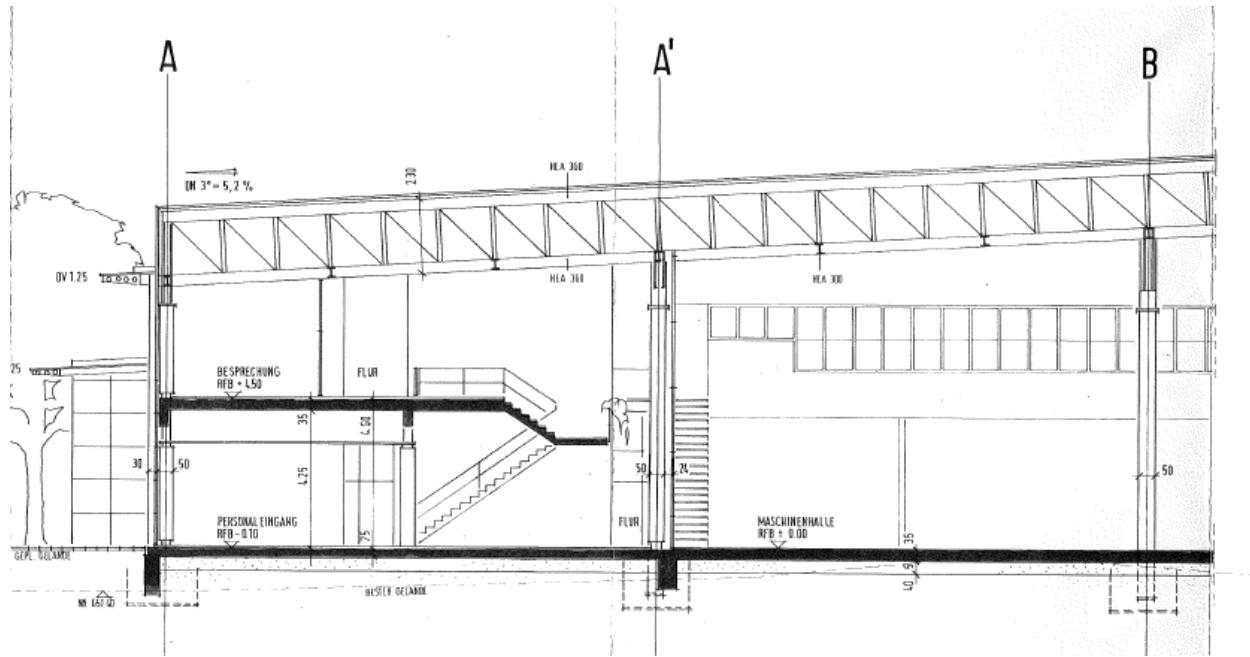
Section C-C of the Hall by Schöne + Seeburger
